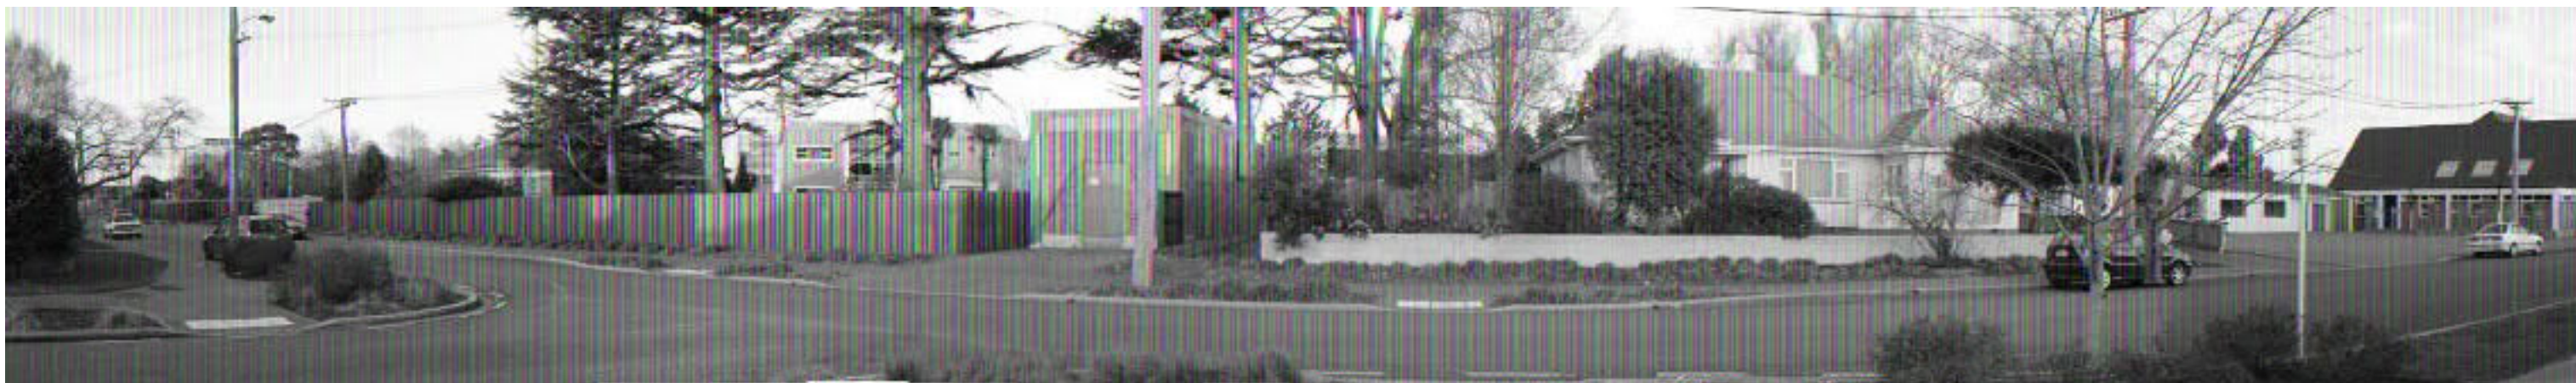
Corner Hoani and Chapel Street Looking East Existing site screened by corrugated iron fence with council owned amenity planting in front
